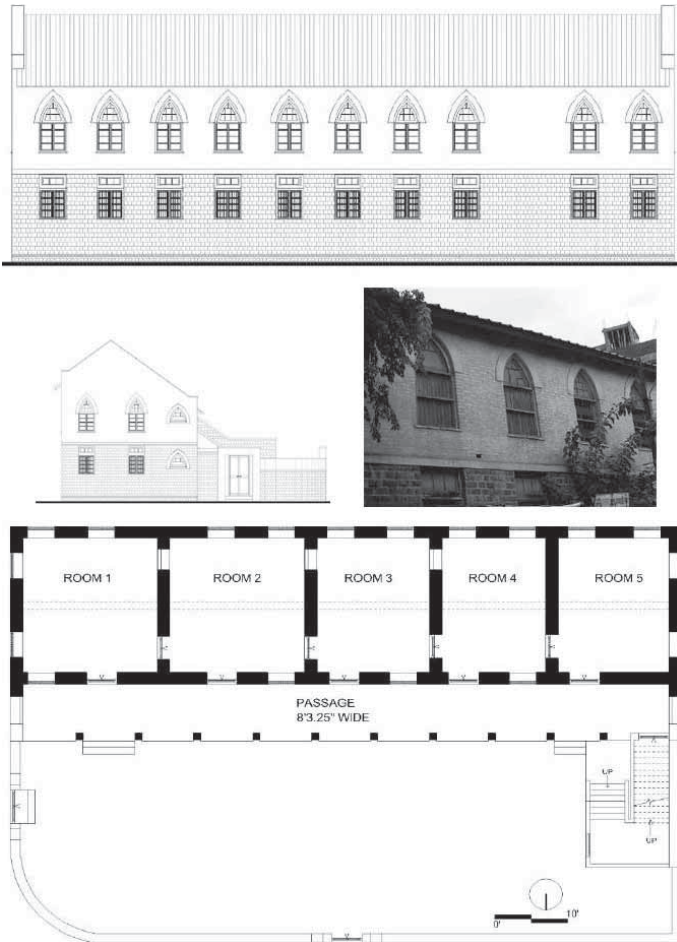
Chaupad Girl's School, 1925: South Elevation, East Elevation, Southern View & Ground Floor Plan
